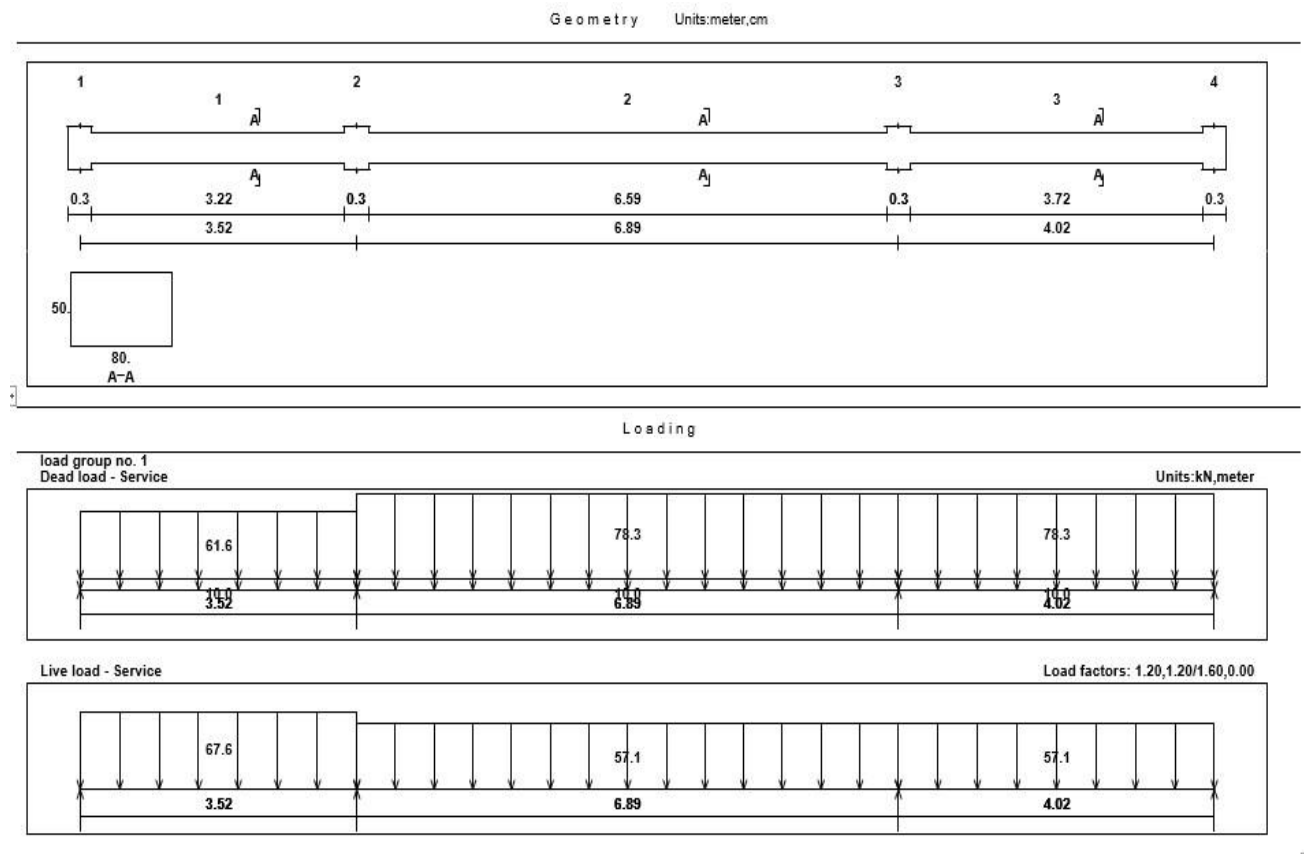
Statically System and Loads Distribution of Beam (B 10).
